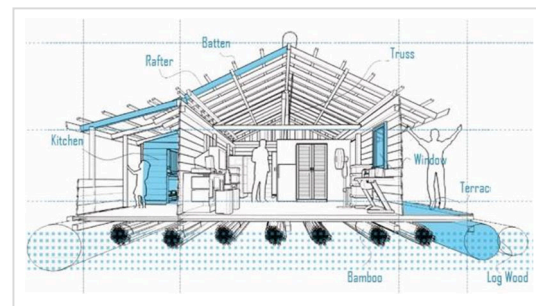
Elevation of Banjarmasin Raft House (*Lanting*)
